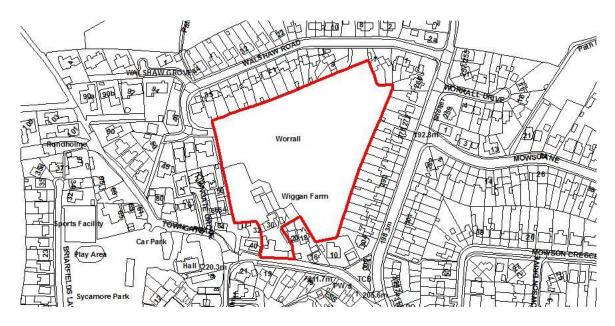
PS Site Location Plan (showing the amended redline boundary) published 2/9/2022
